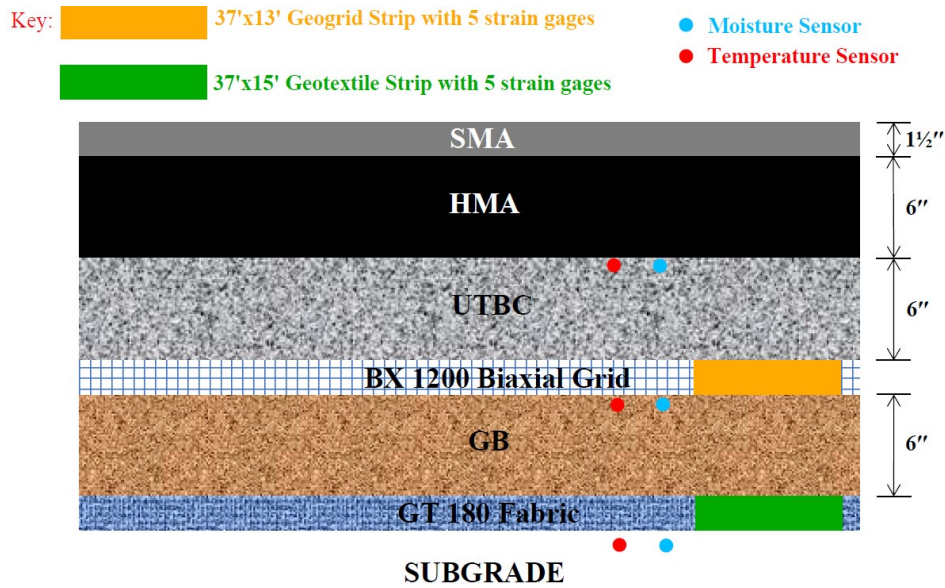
Cross section of pavement system for test section #1 (control)
